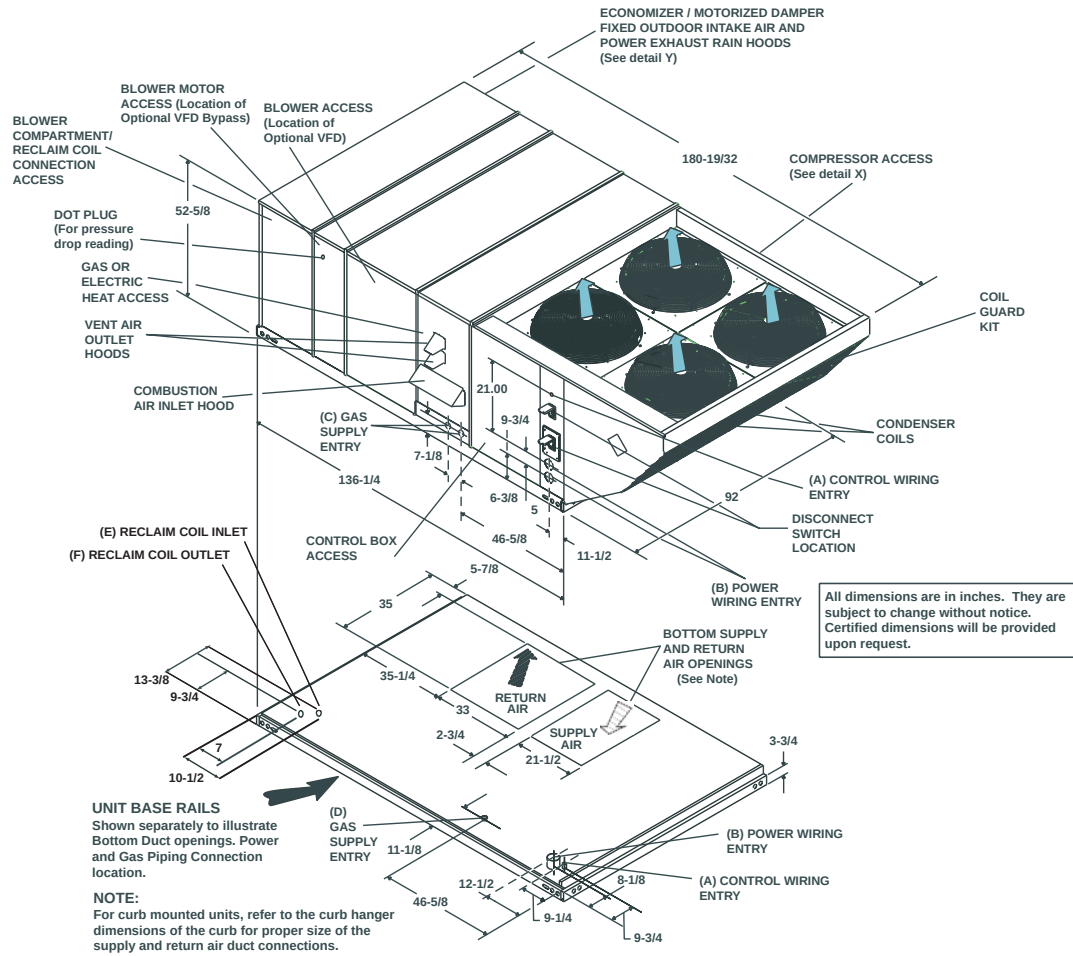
UNIT DIMENSIONS WJ180, 240, & 300 (FRONT VIEW)
